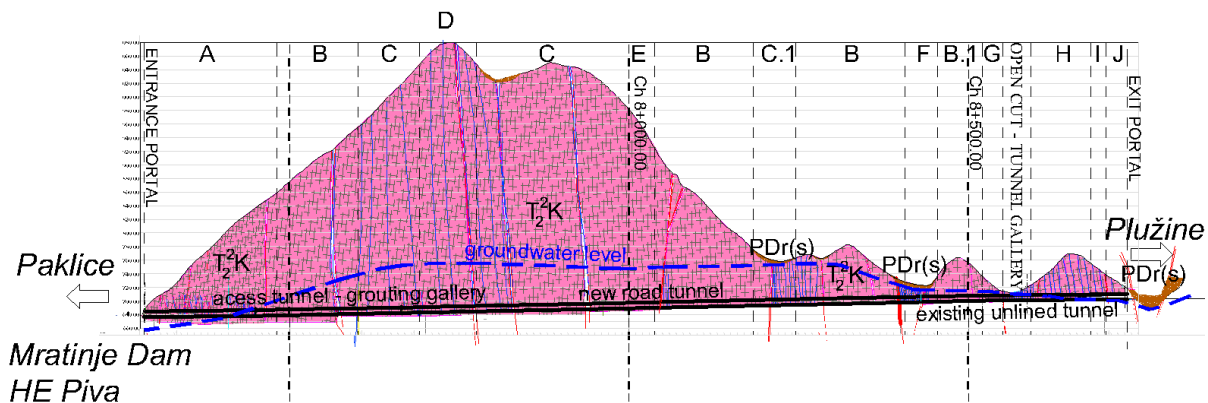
Longitudinal geological section of the new tunnel located after the Mratinje dam
